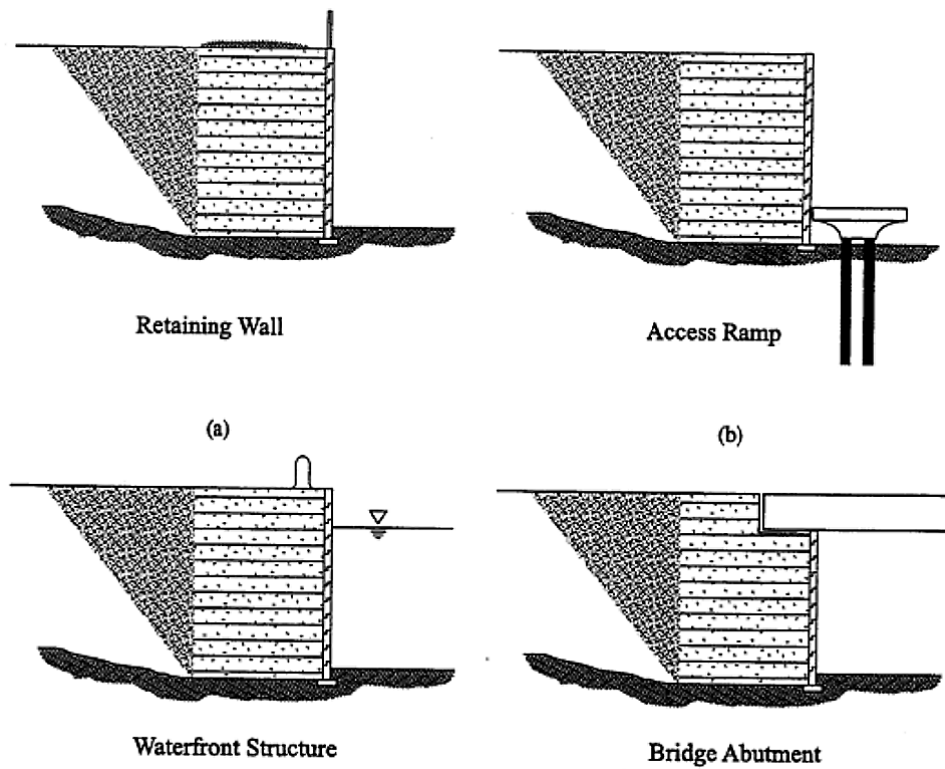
Reinforced Wall Applications (Berg *et al.*, 2009).
